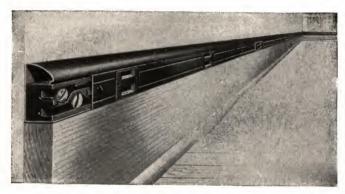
"Plug-in-Strip" Baseboard Method of Wiring Courtesy of National Electric Products Corp., Pittsburgh, Pa.
